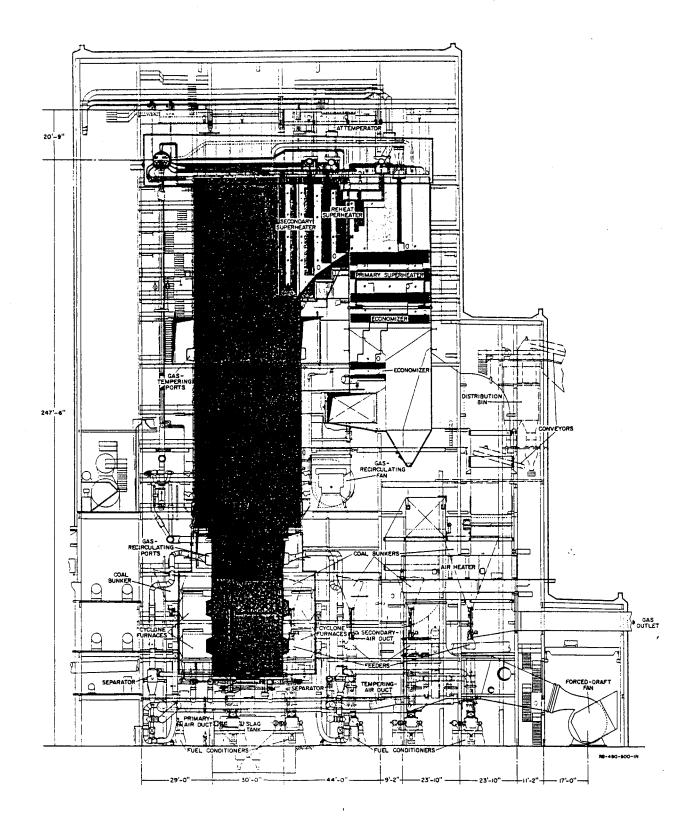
Big Stone Steam Plant- Unit No. 1
